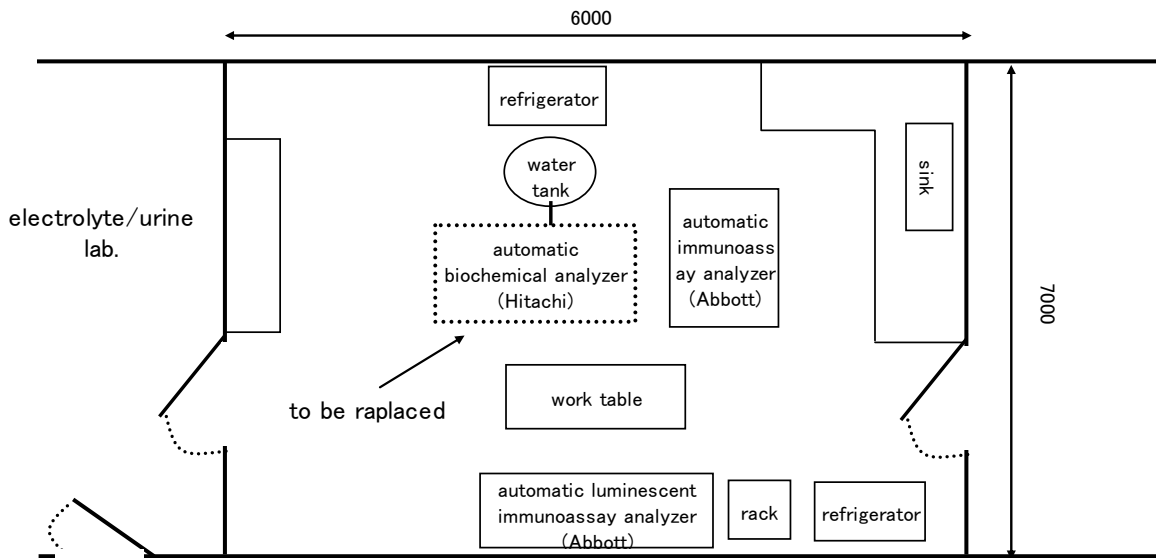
Layout plan of Automatic bio-chemical analyzer
